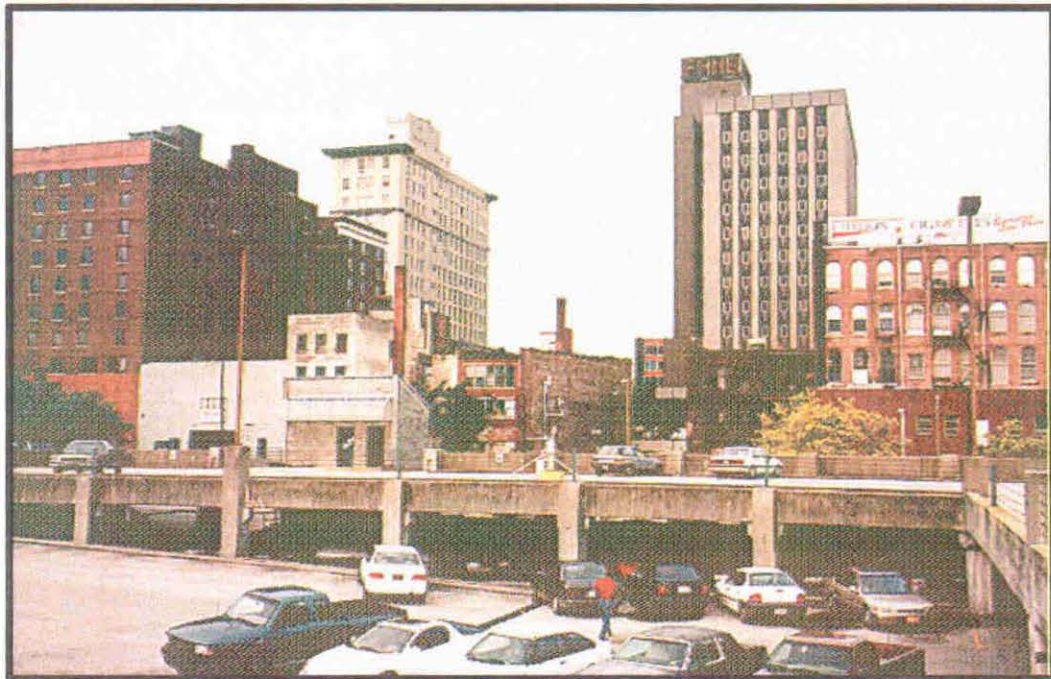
View of equipment on the Knoxville garage roof, looking west. Equipment is visible at lower center.
